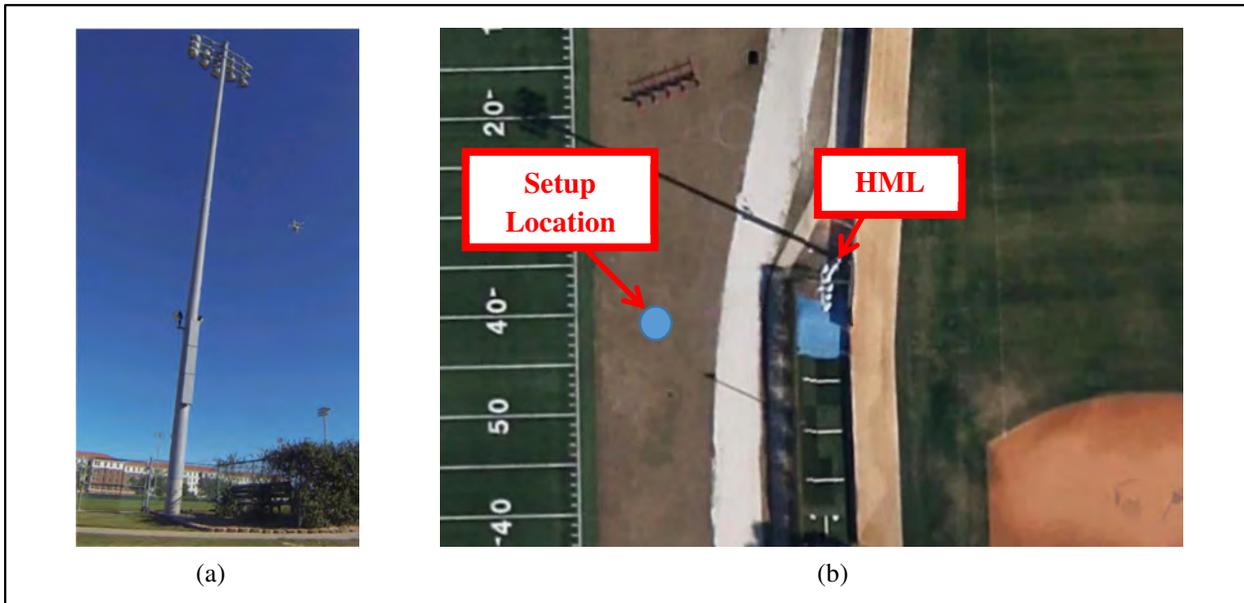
(a) 90ft Galvanized Steel HML with 15-Light Structure (b) Top View of Setup Location
